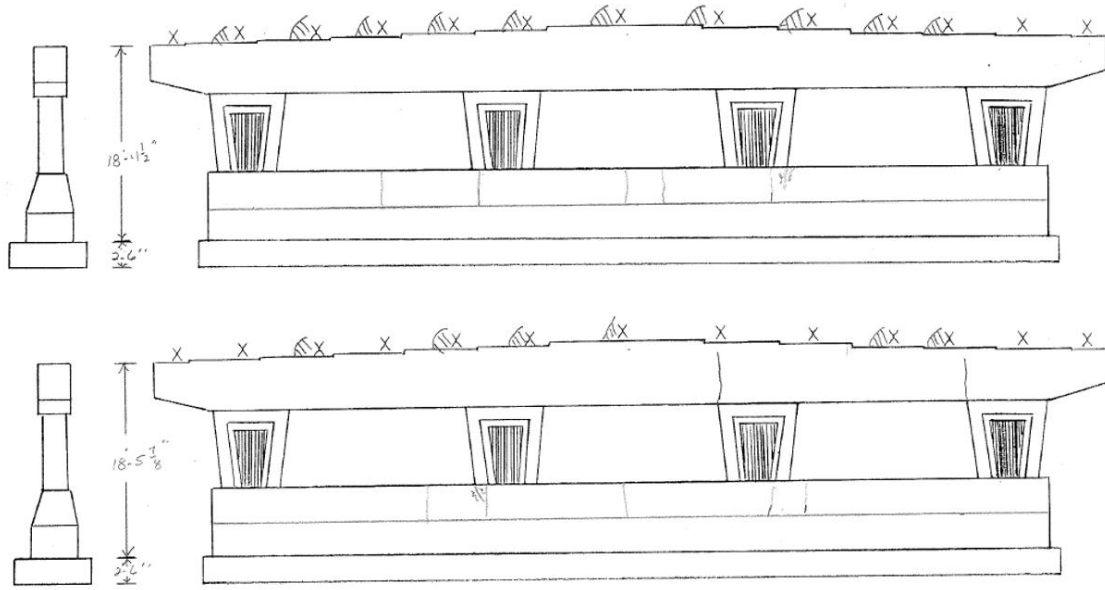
Inspected frame pier in Sioux City, Iowa
